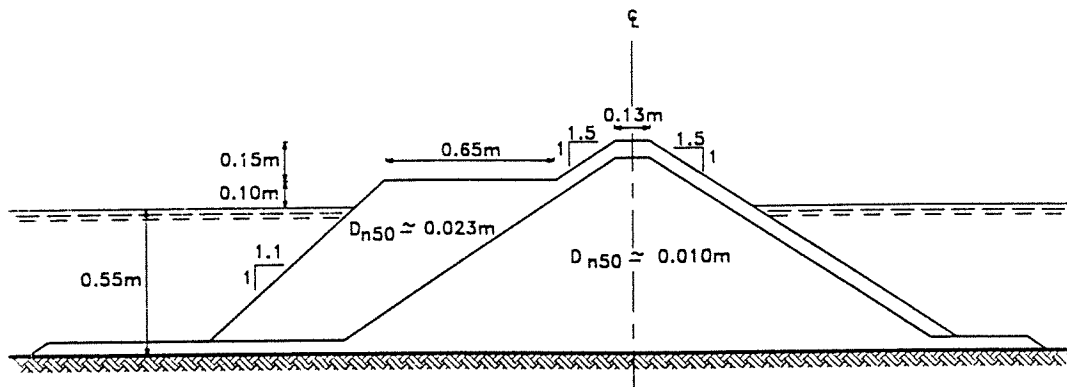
Cross-section of the initial profile for the trunk. The roundhead was made by rotating the profile around the centreline.
